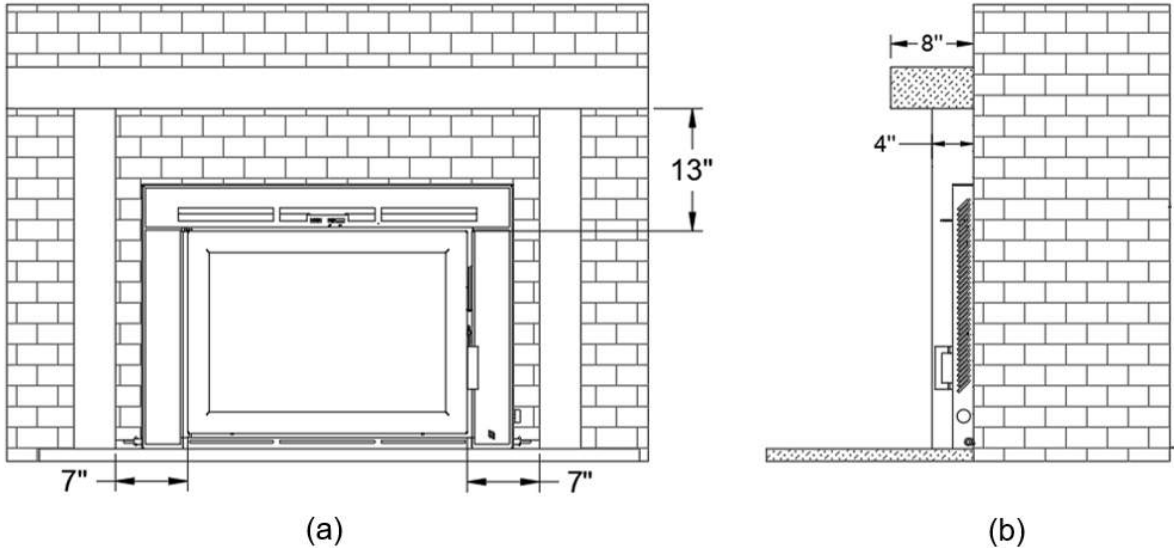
Clearances to Combustibles (a) Front View (b) Side View
